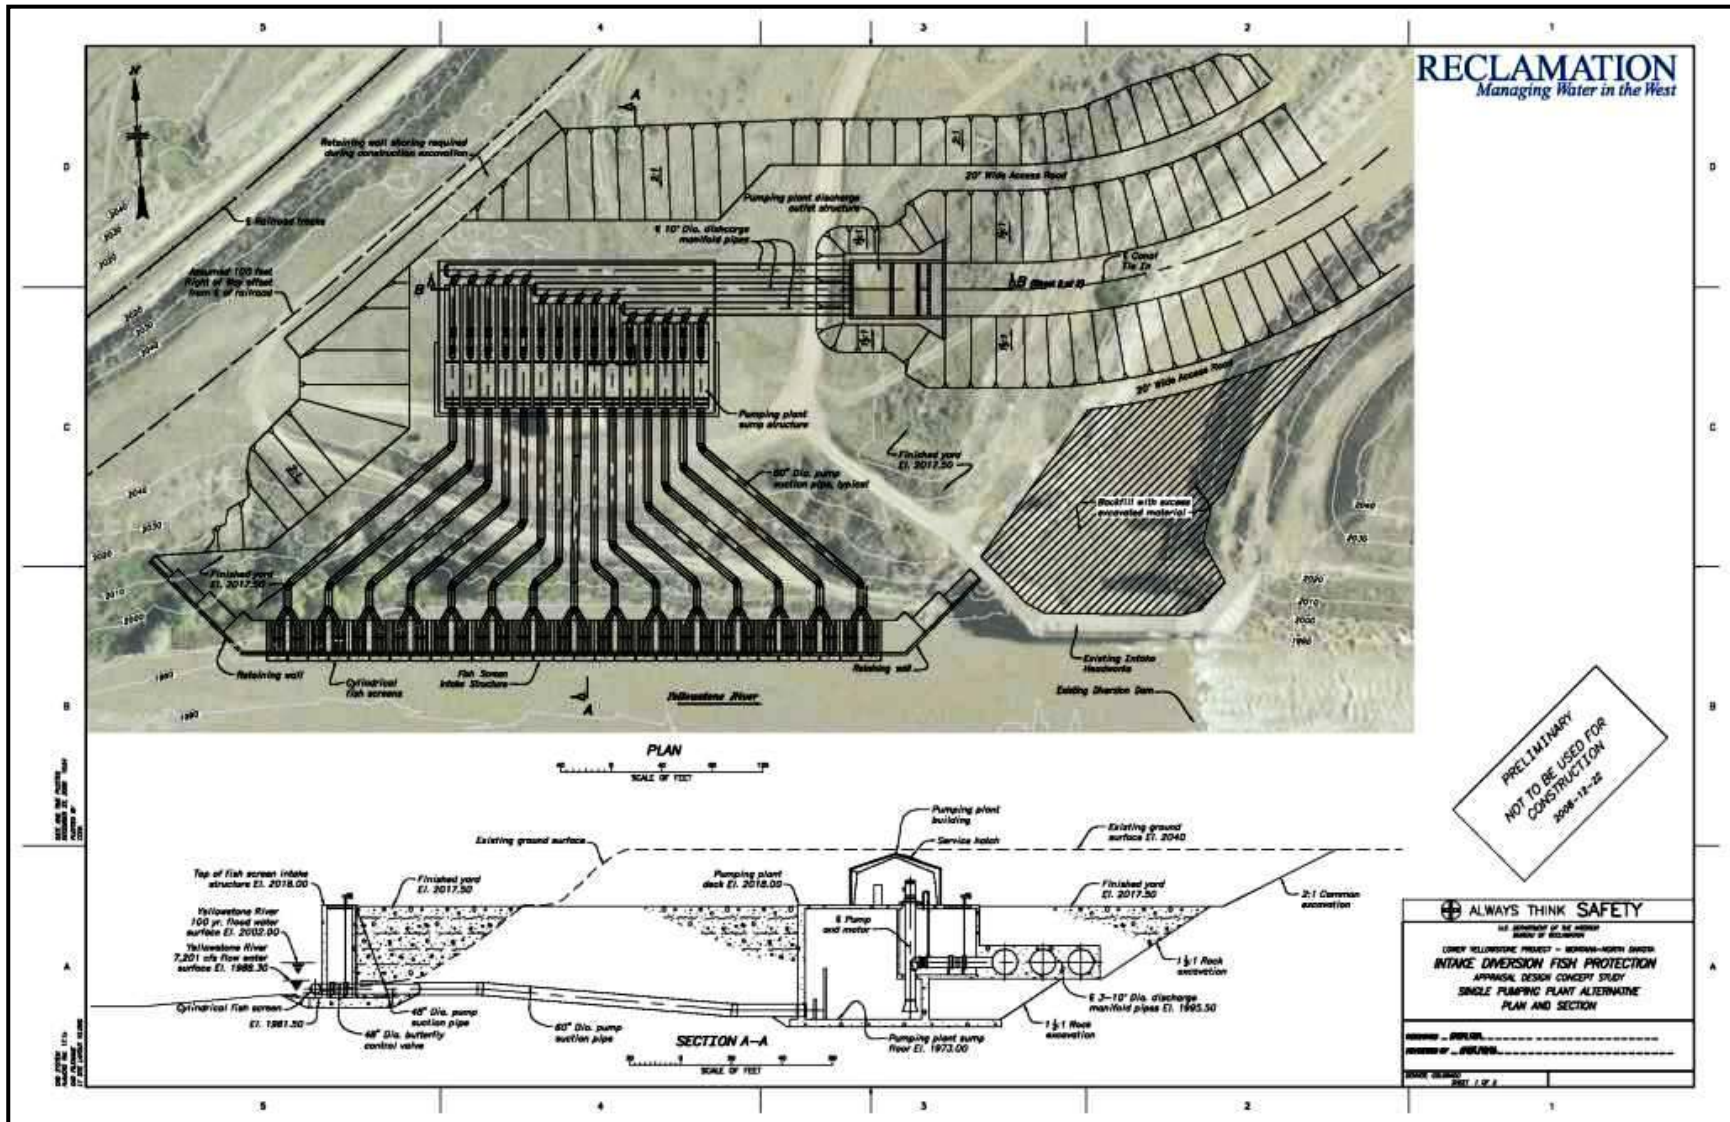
Single Pumping Plant Alternative Overview.
